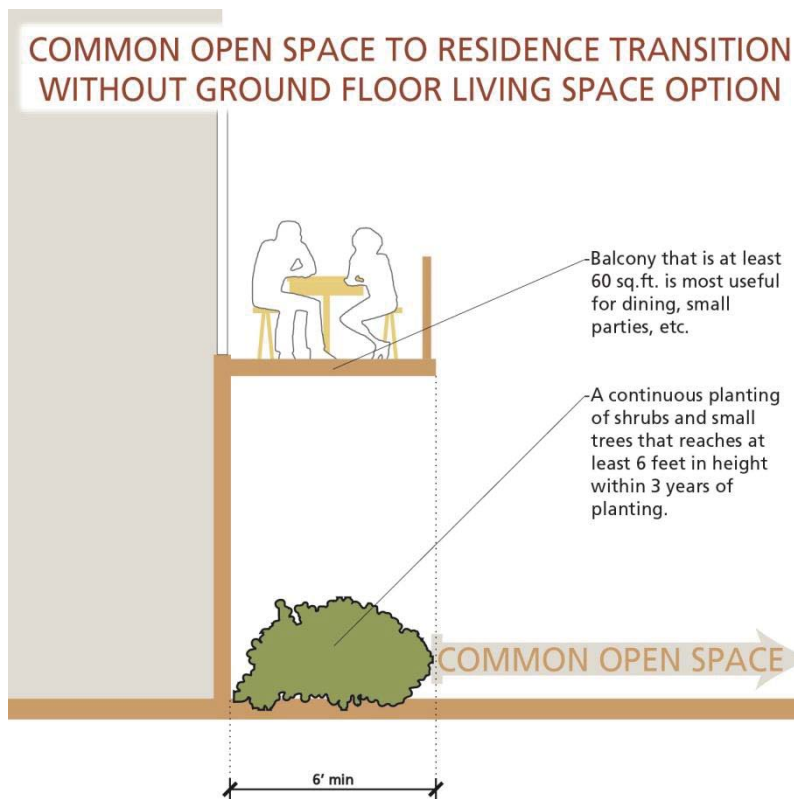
Planting requirements for residences without a ground floor living space fronting a common open space.
